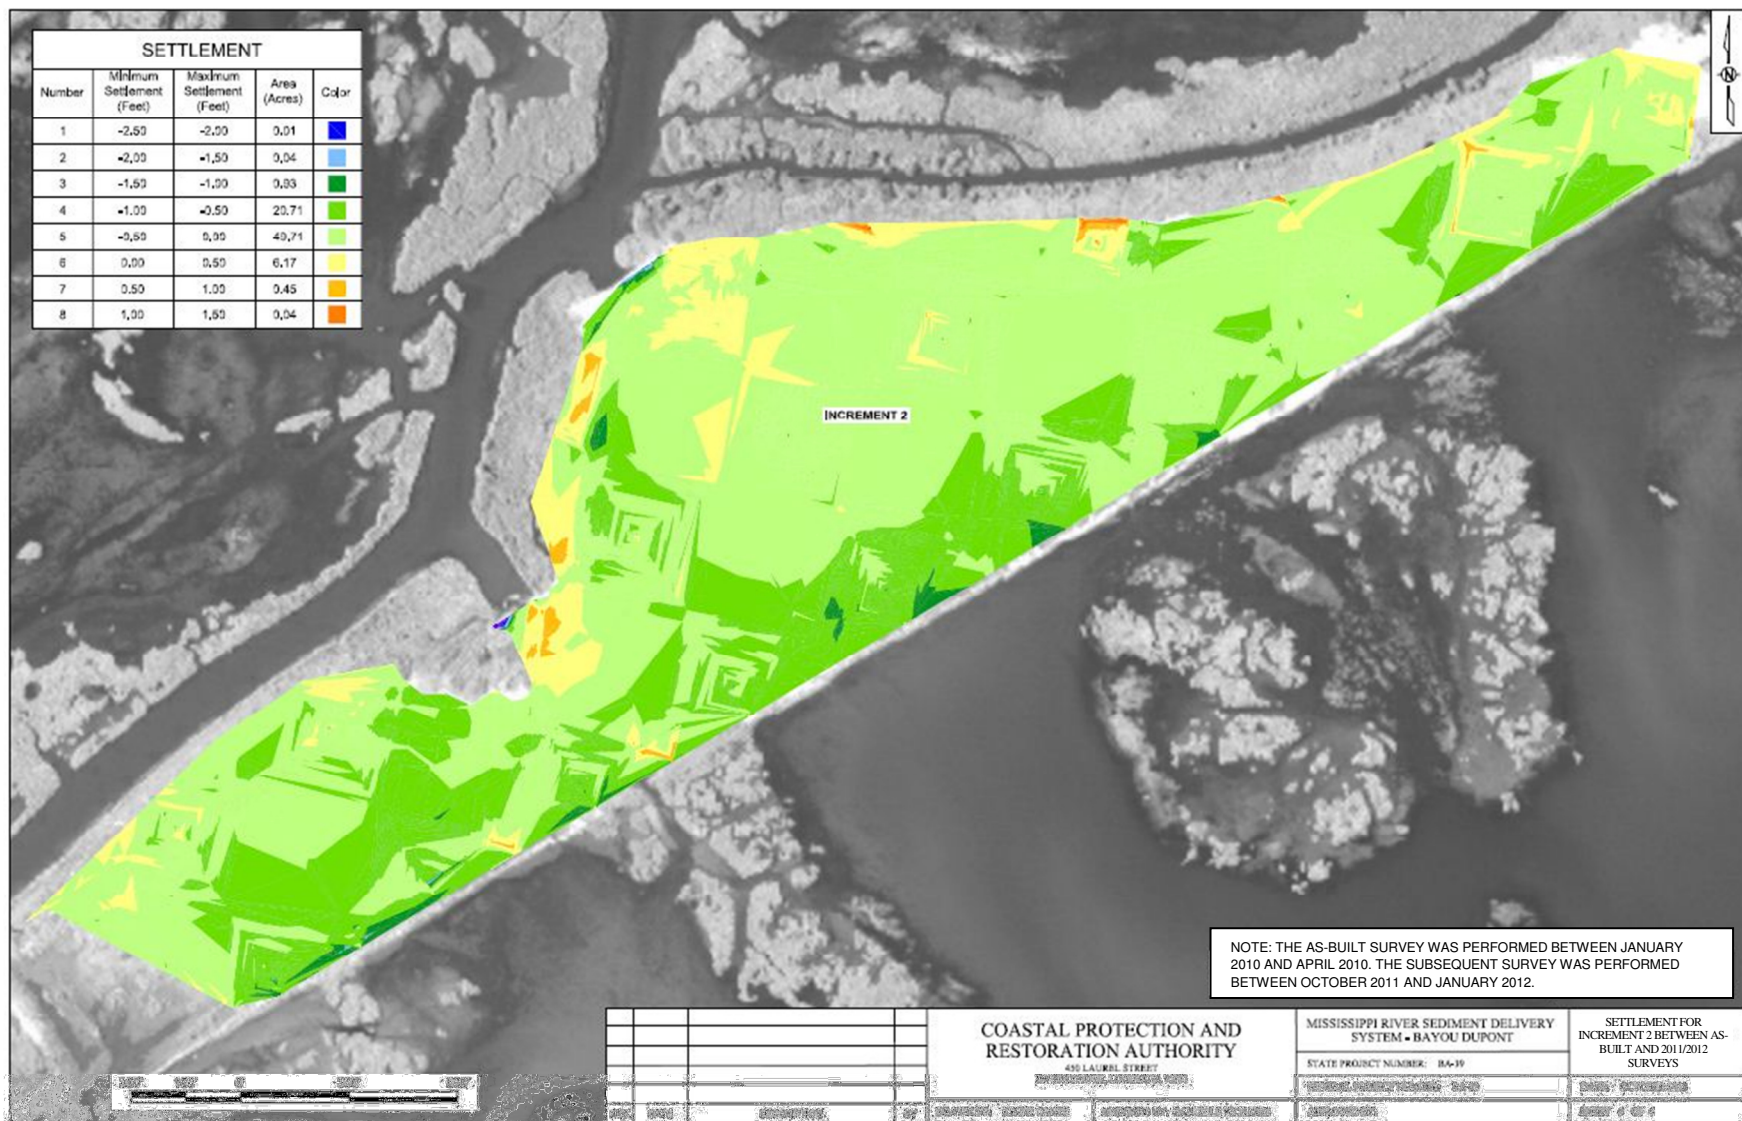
Settlement of BA-39 Increment 2 between the as-built (2010) and 2011/2012 elevation surveys.
